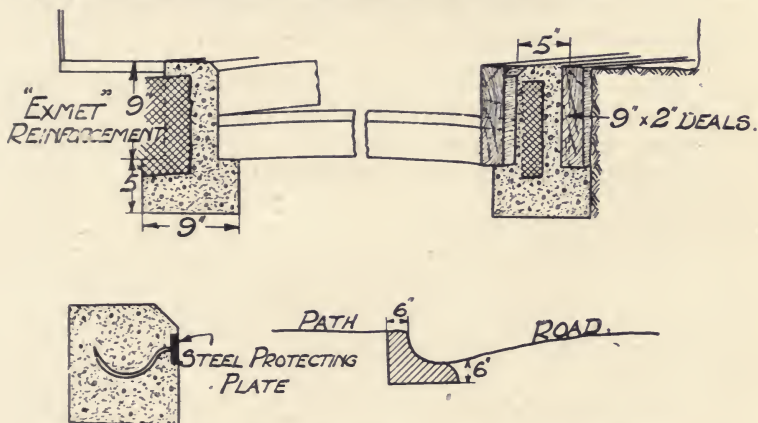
Method of constructing concrete kerbs in Surrey.
